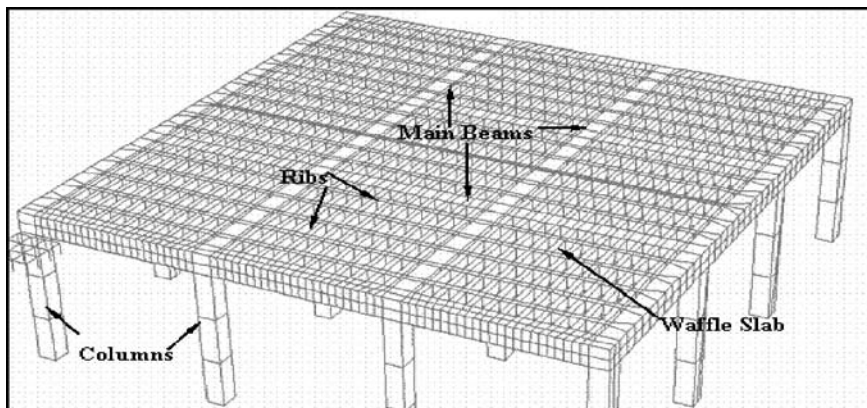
Finite element model of waffle floor system ( $3 \times 3$  panels).
